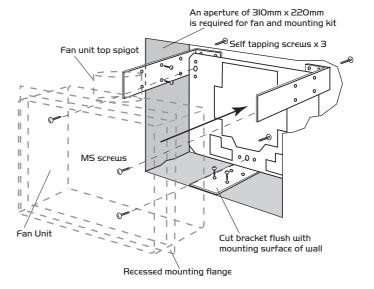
Recessed mounting frame kit in wall aperture with top mounted spigot configuration.
